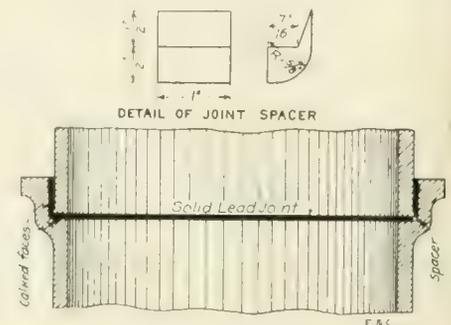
Detail of Pipe Joint and Joint Spacer, Chelsea Creek Water Tunnel.
